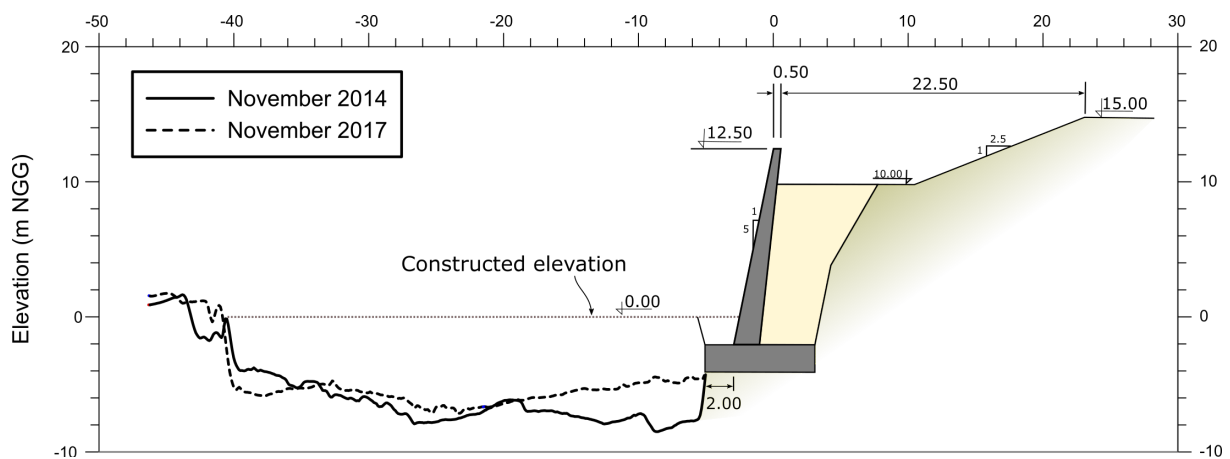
Cross-section through bottom outlet looking downstream, 2014 elevation.
